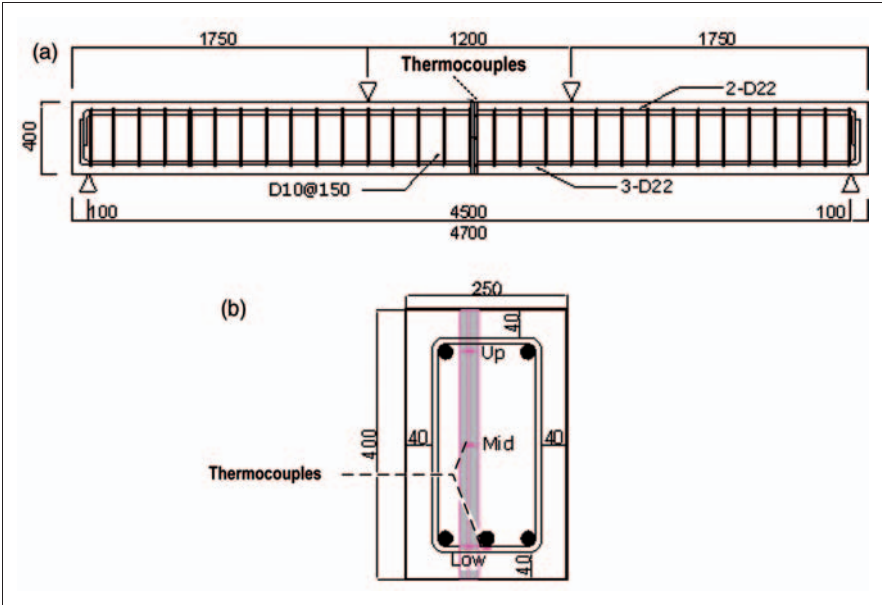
Configuration of beam specimens (mm): (a) dimensions of test specimen; (b) details of beam section (cover thickness = 40 mm).
